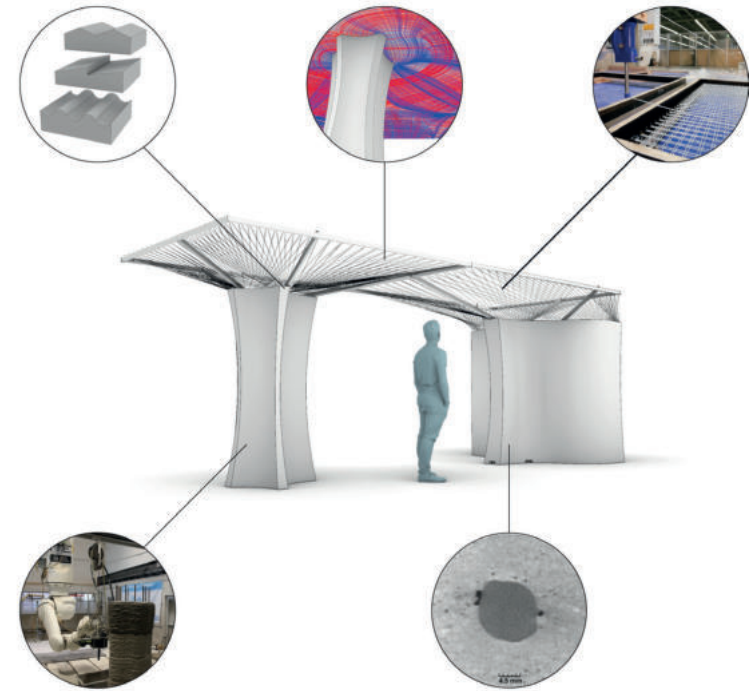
Shelltonics Demonstrator: AM-Section of building construction; Length 6,35m, Height 2,40m, Width 2,40m
